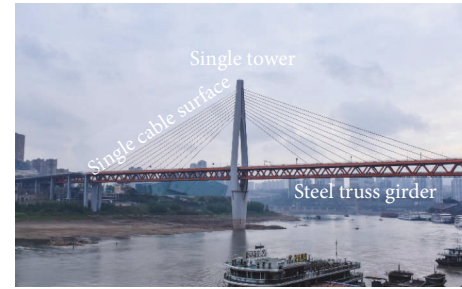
A steel truss cable-stayed bridge with a single tower and a single cable plane (m).
